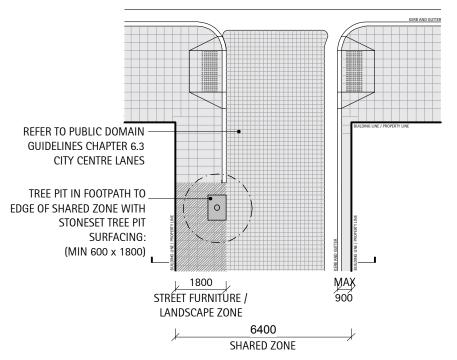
Street Tree Typical Pit Location: 6400mm Wide Lane
